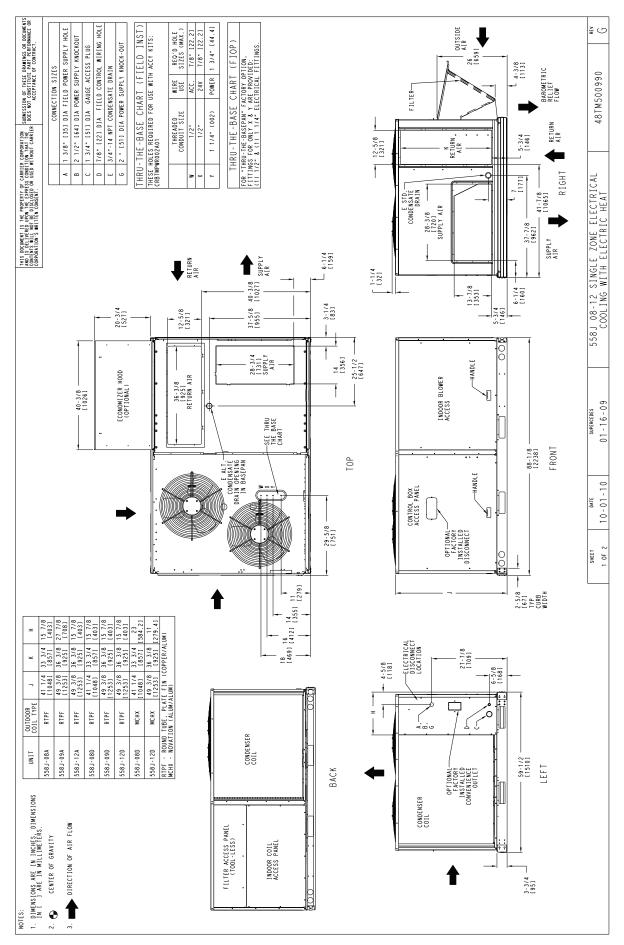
Unit Dimensional Drawing — Size 08, 09, 12 Units
